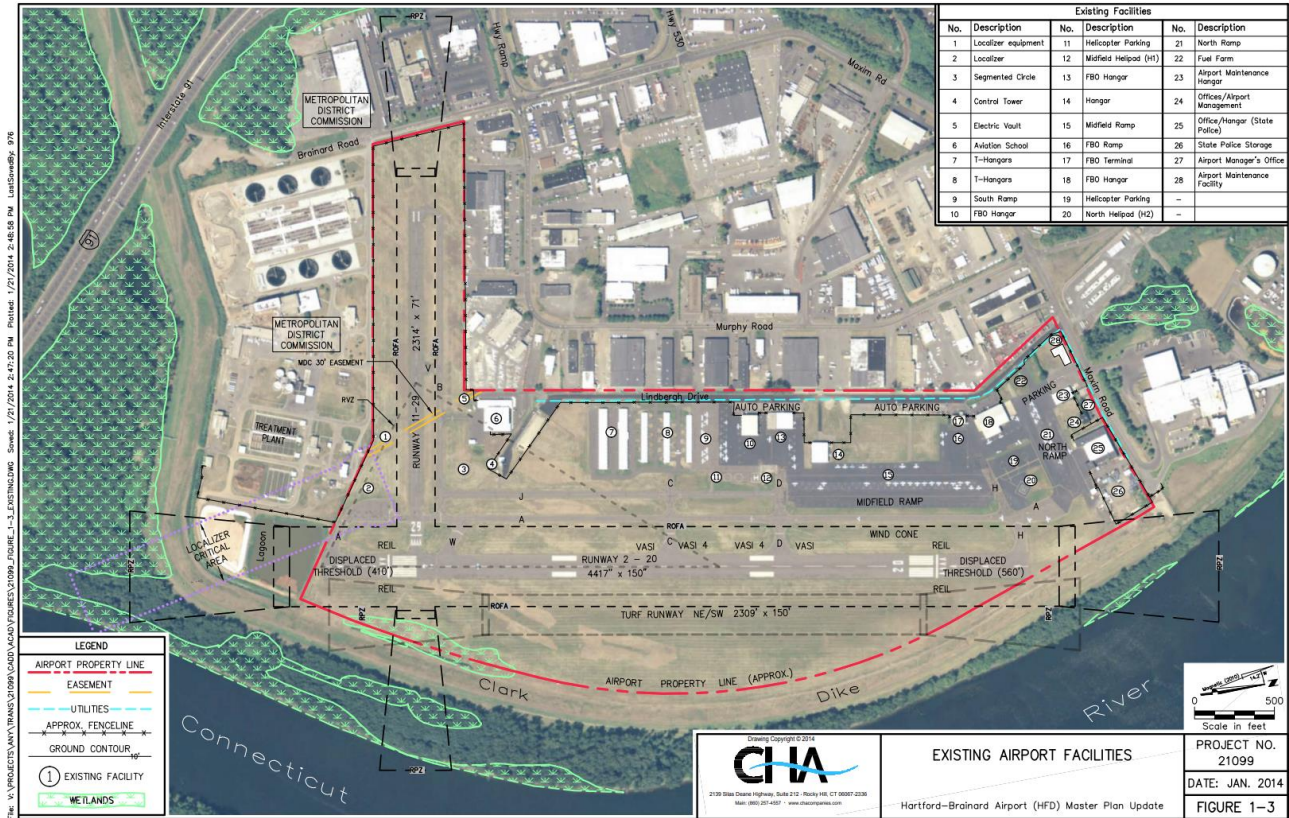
Runway Protection Zones Among Existing Airport Facilities
